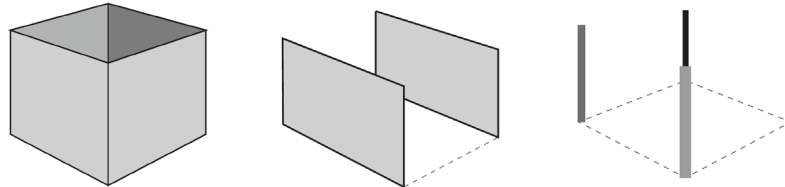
Solid, disc and frame construction (Author, 2018)
